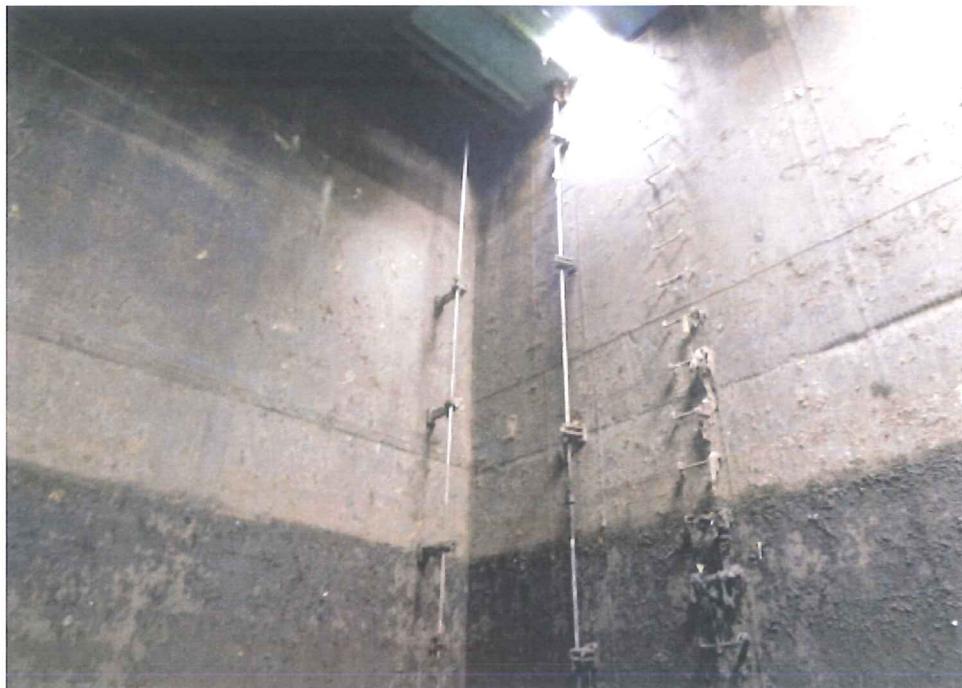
BOTTOM OF WALL SHOWING T-LOCK & EPOXY COATING
